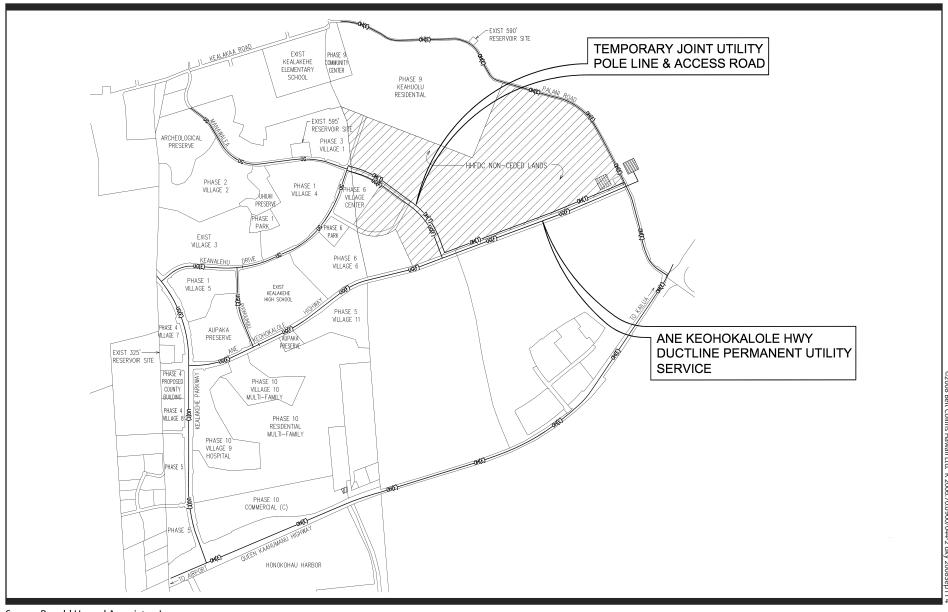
OFF-SITE ELECTRICAL CONCEPT PLAN (HELCO)
